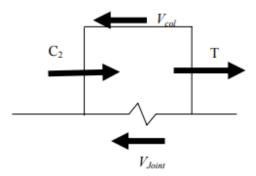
Joint Shear (source: Explanatory Examples for Ductile Detailing of RC Buildings IITK-GSDMA_EQ22-V3.0)
